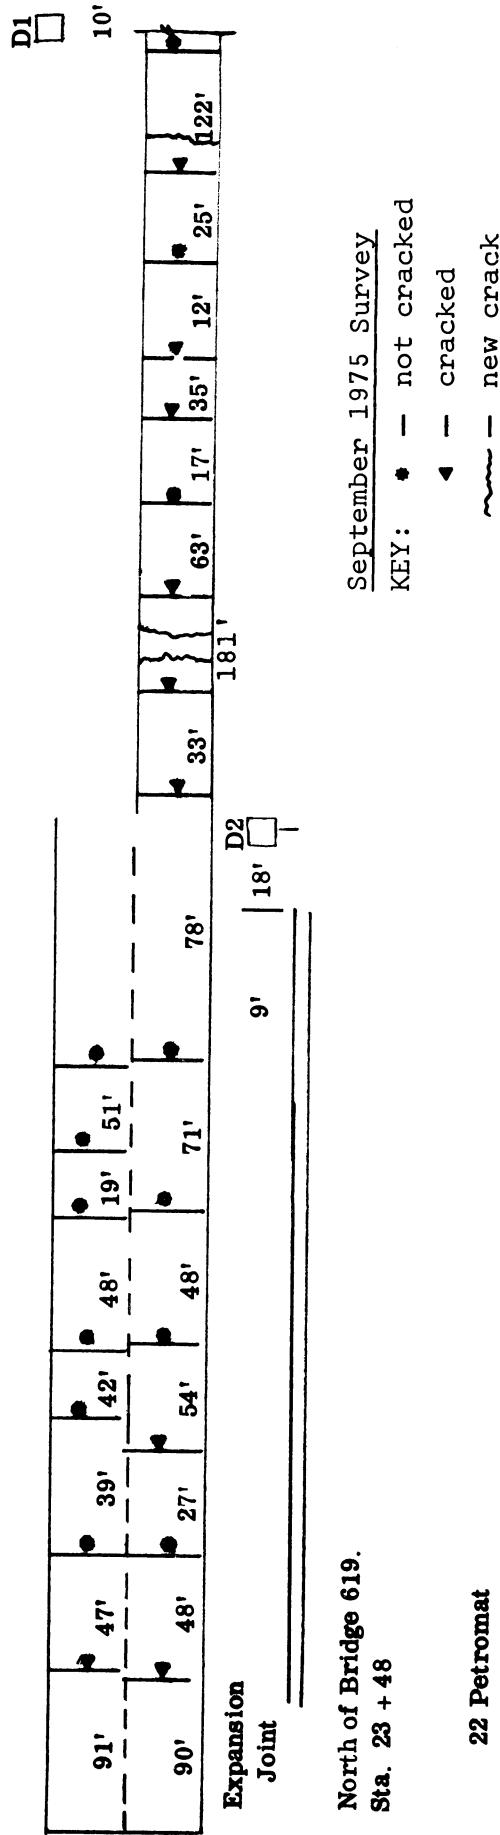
Site #3 — Roadway C northbound. (Not to scale.)
